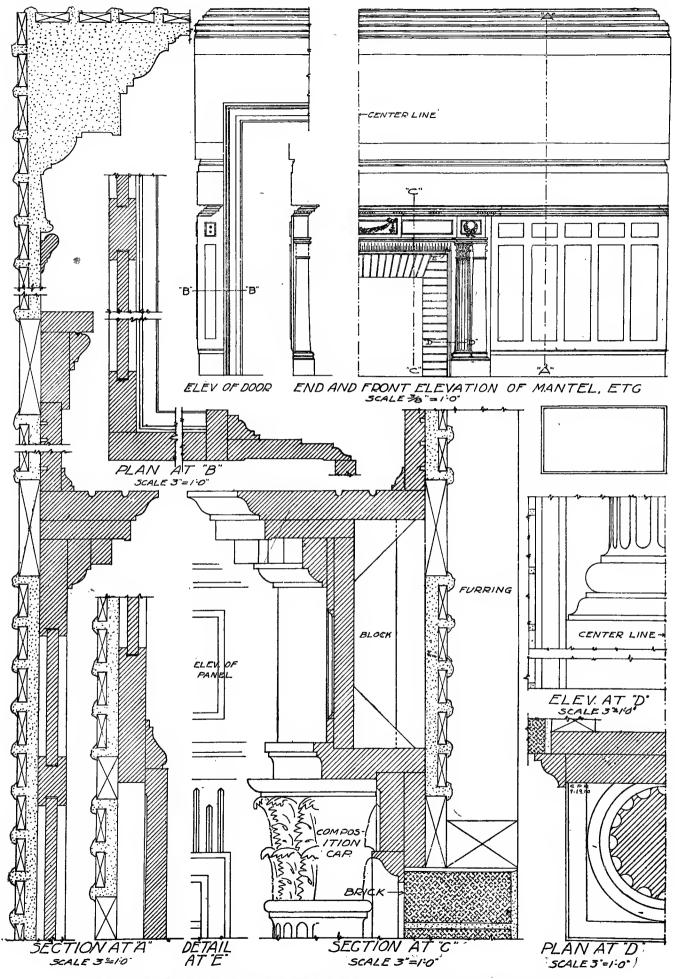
DETAILS OF TRIM FOR COLONIAL DINING ROOM
